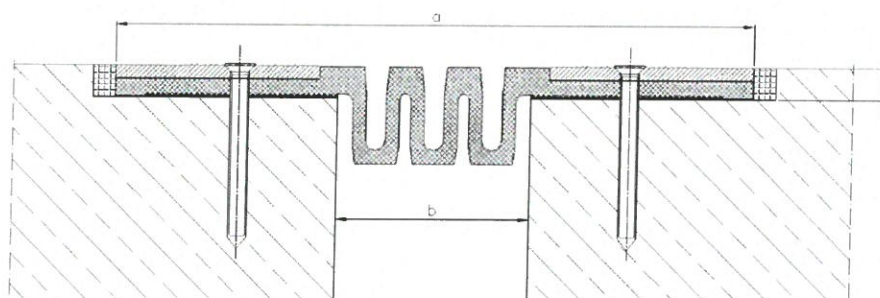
CONECTO PARK SL 230.70.W waterproof expansion joint profile – recessed installation
